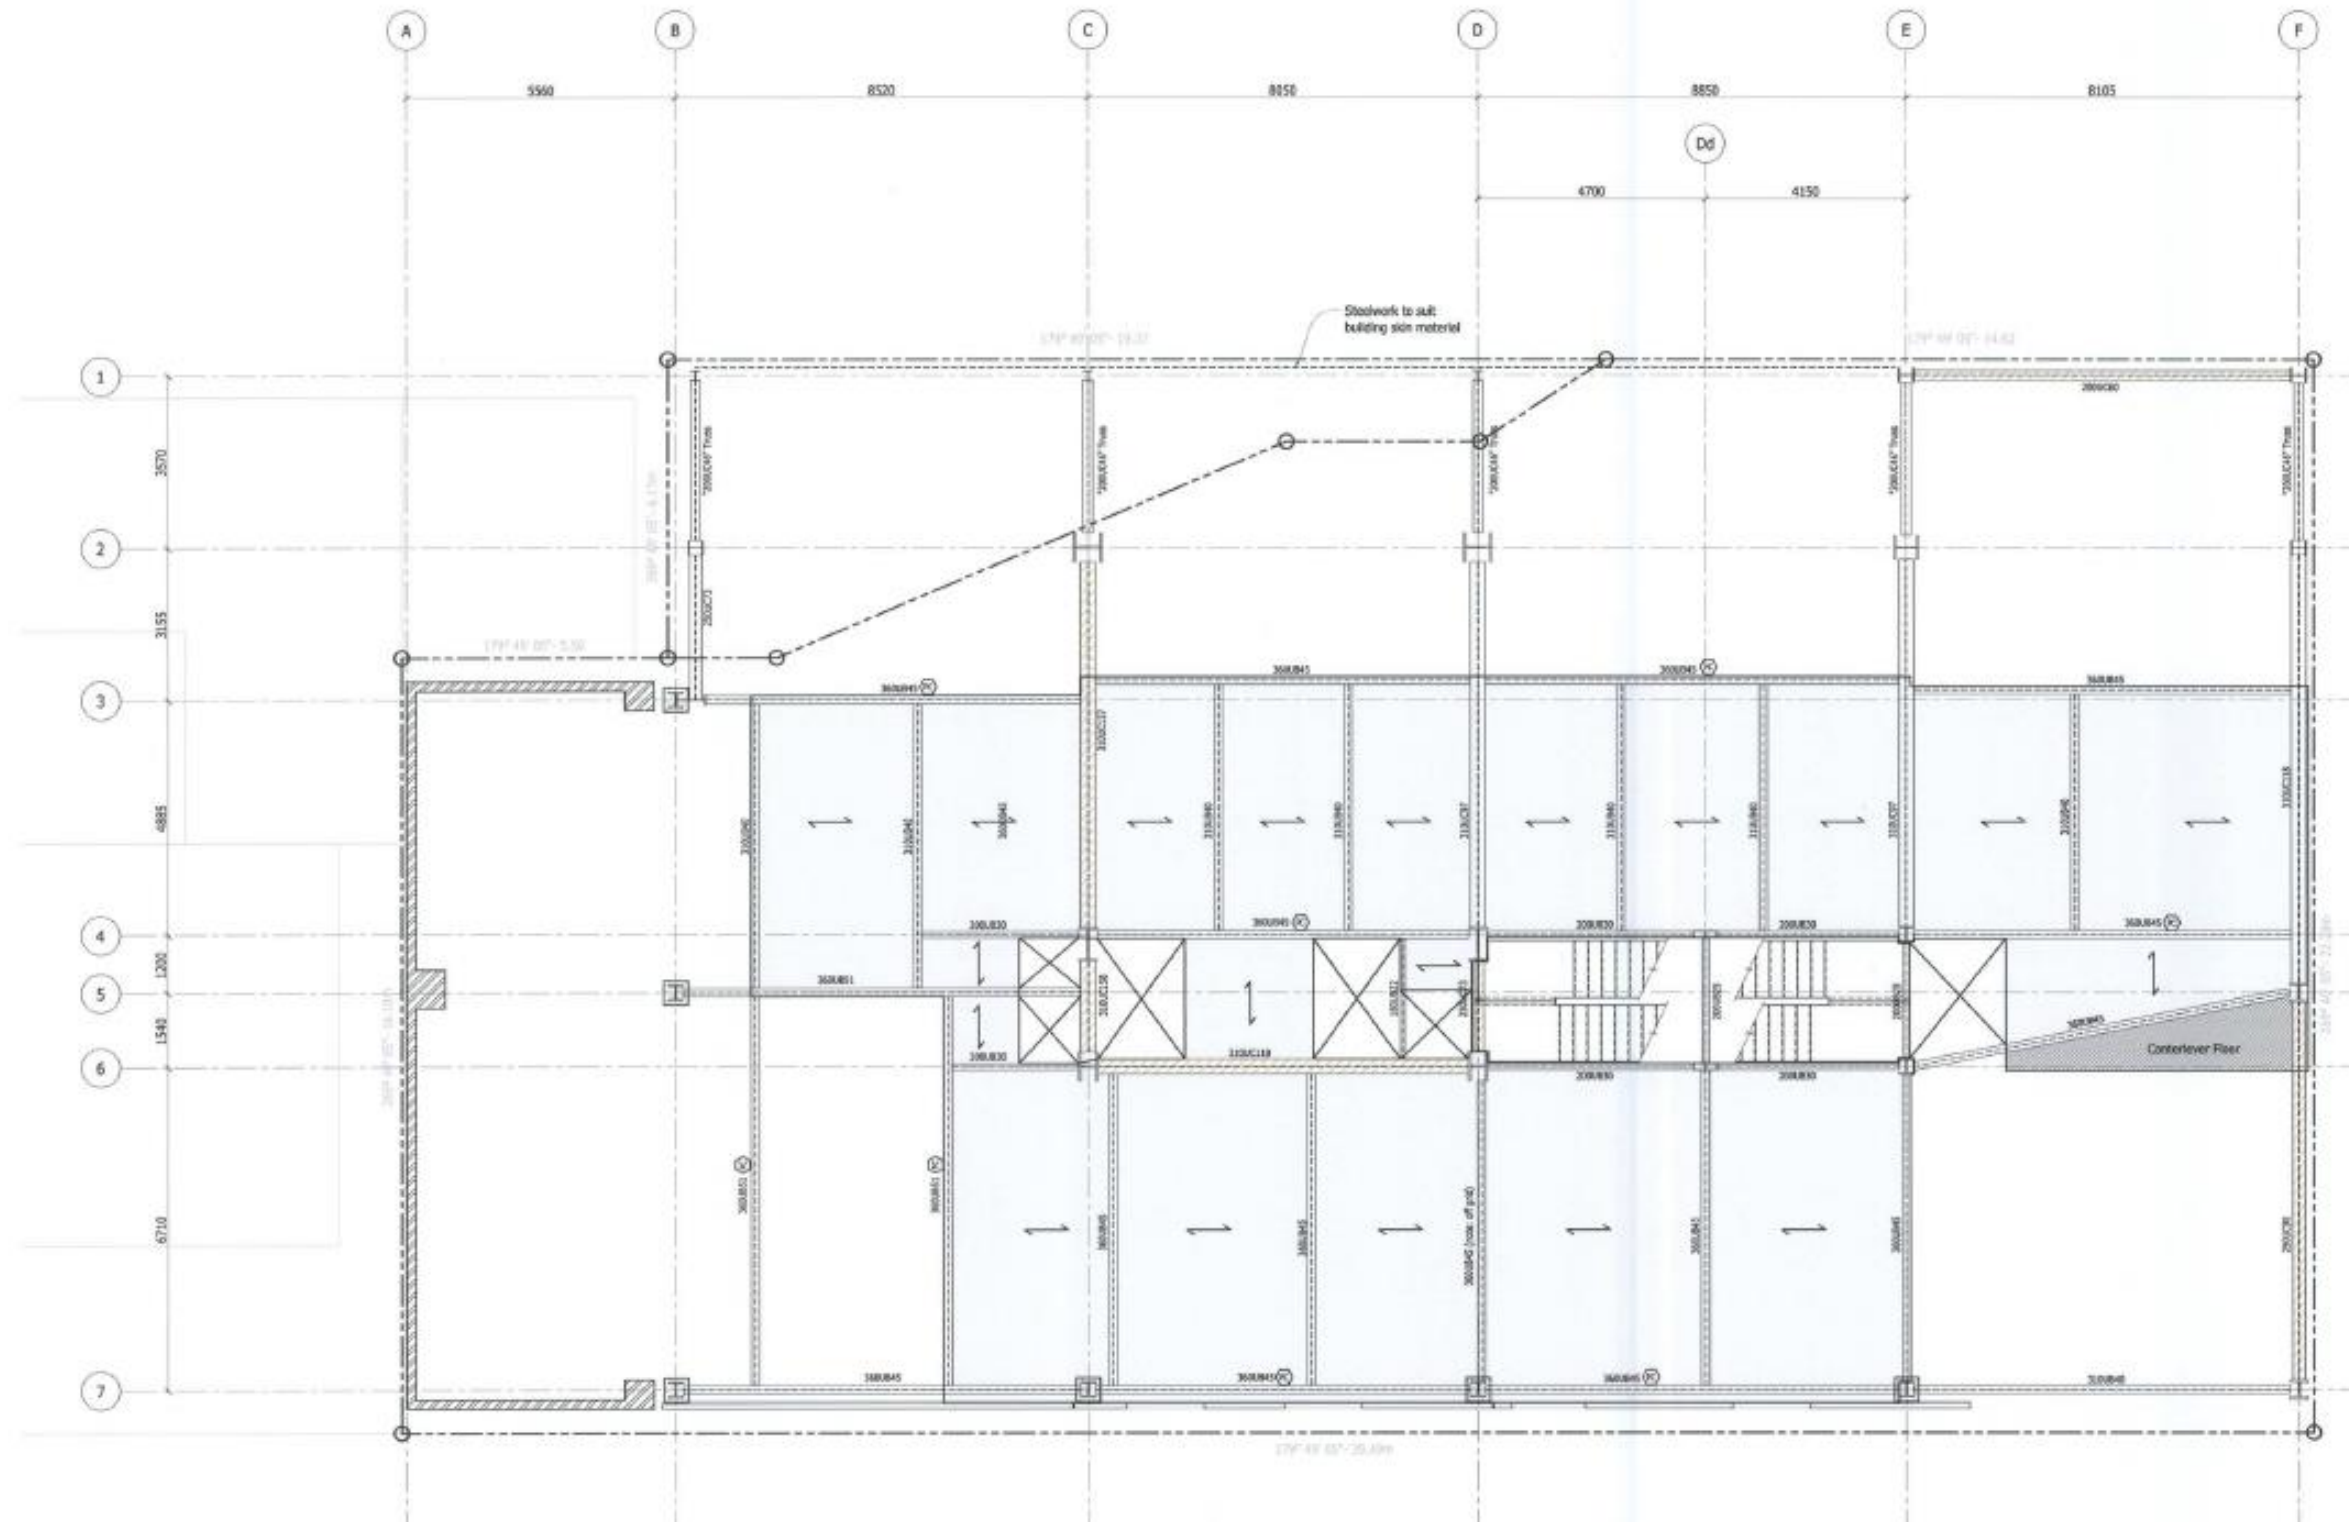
Structural Plan Level 5 (Christchurch City Council 2016c)
